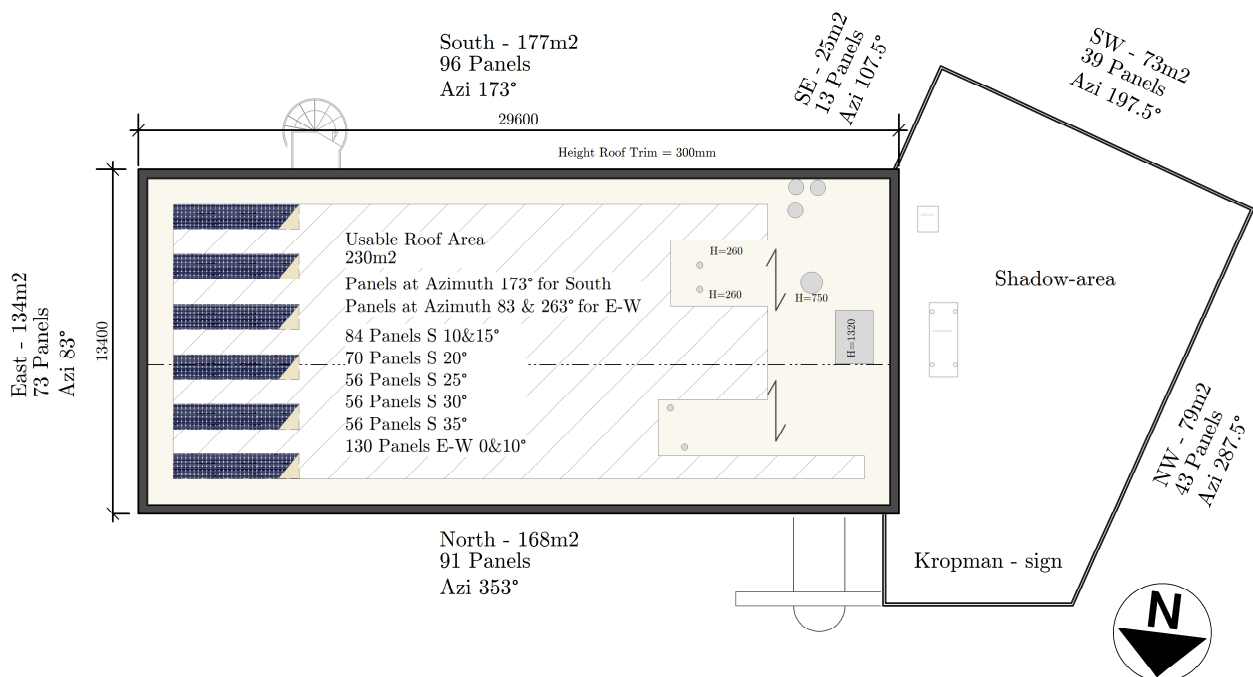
Available area for PV-panel placement, on façade and upper roof. Azimuth (Azi), 0° = north, 90° = east, 180° = south 270° = west.
